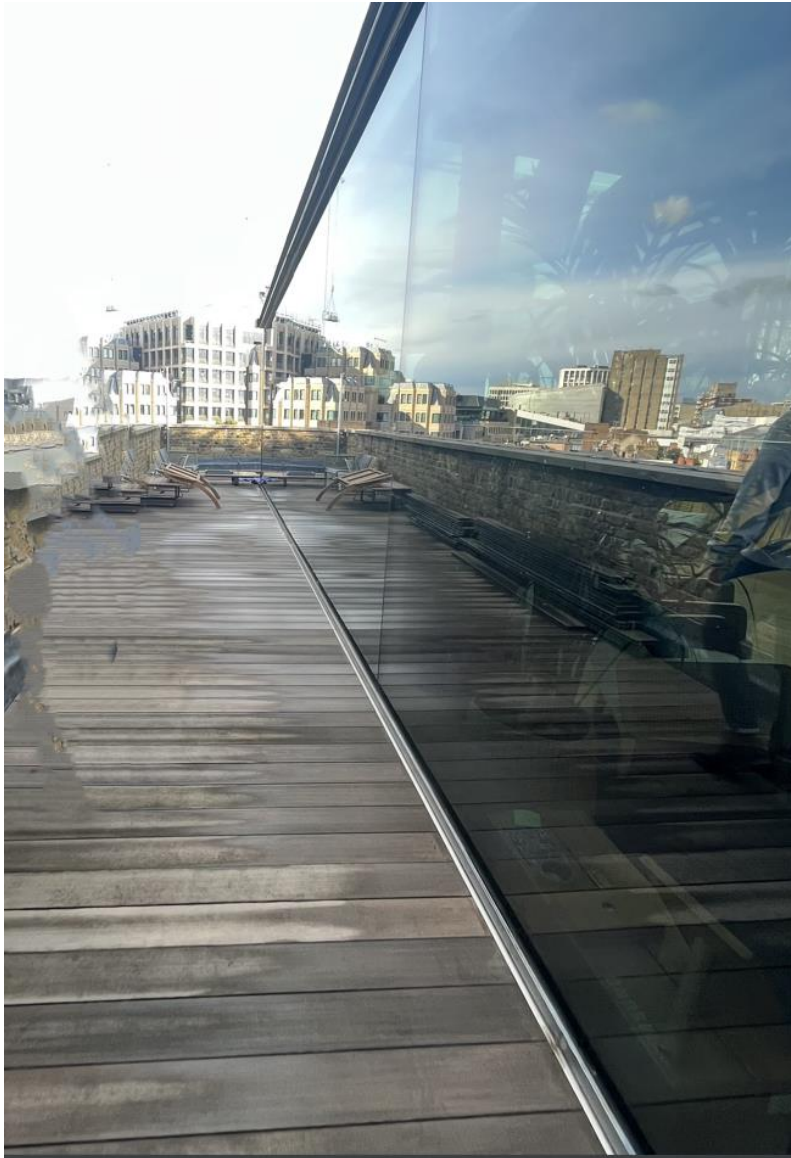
(above): Northern section of the flat roof facing Earlham Street looking east towards Neal Street
